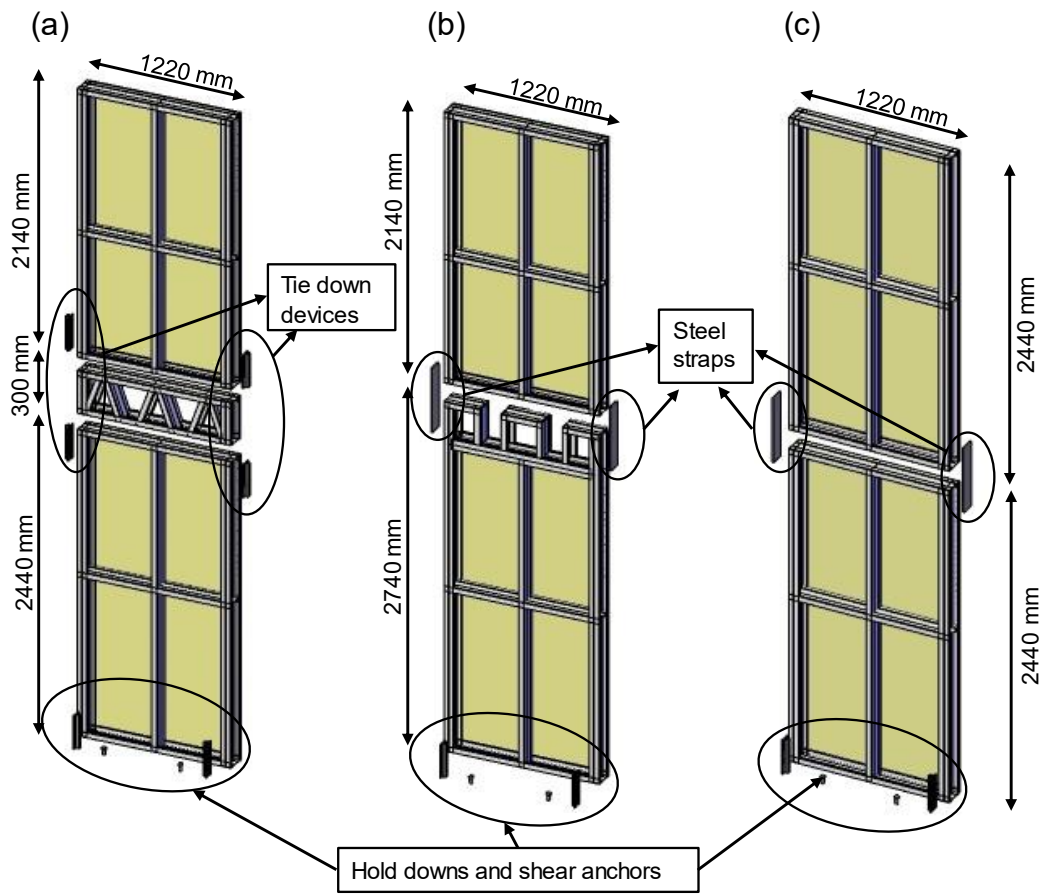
General configurations of shear wall specimens: (a) platform framing detail-1; (b) platform framing detail-2; (c) ledger framing detail
